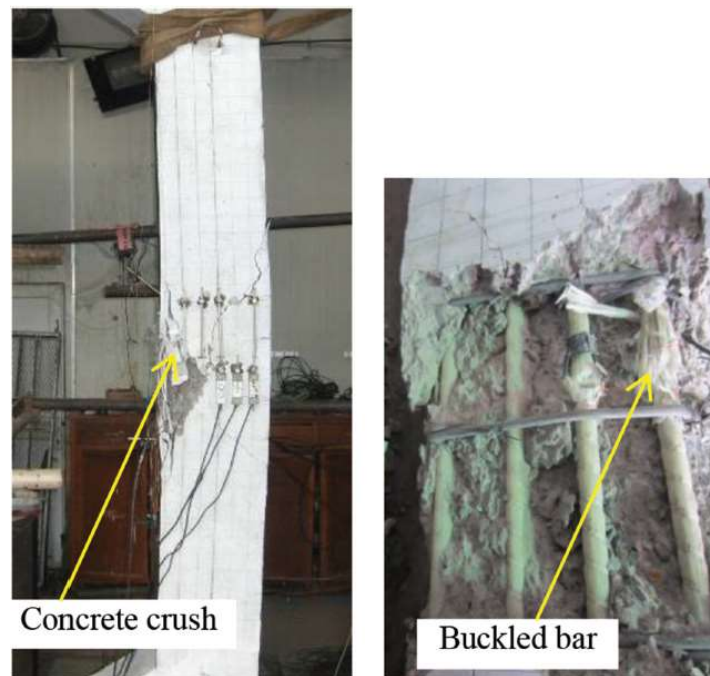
Typical failure mode of columns (Xue et al. 2018).
